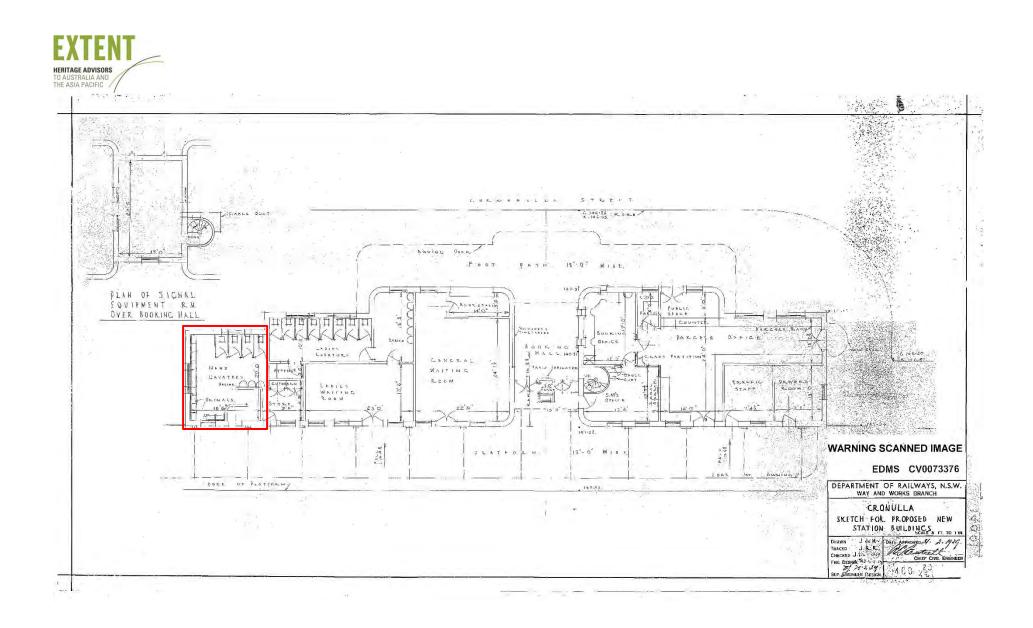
1939 plan showing the original layout of the subject site, outlined in red (Source: Sydney Trains Plan Room, EDMS CV0073376).
